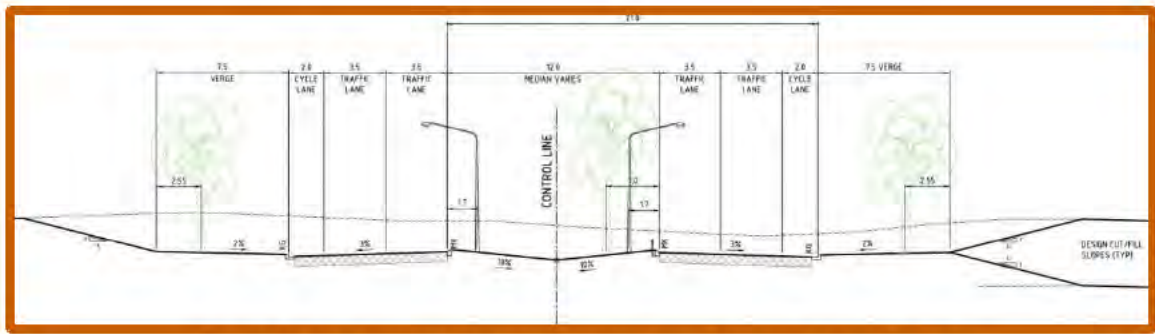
John Gorton Drive and Coulter Drive Extension Cross Section
